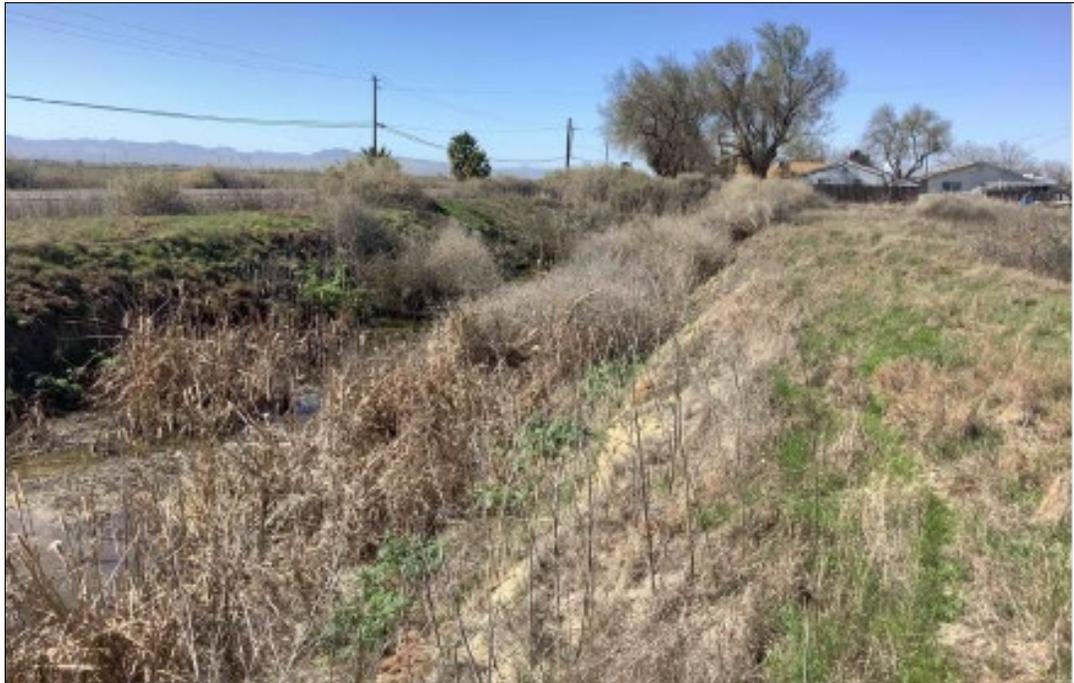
Representative Photo of Project Site, Drainage Ditch, and Henry Miller Avenue Beyond.
